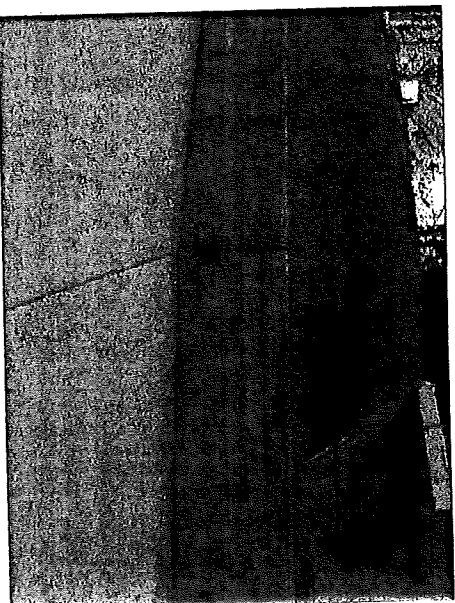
Wooden retaining wall has an area of spalling near the garage entrance. Further analysis needed.
